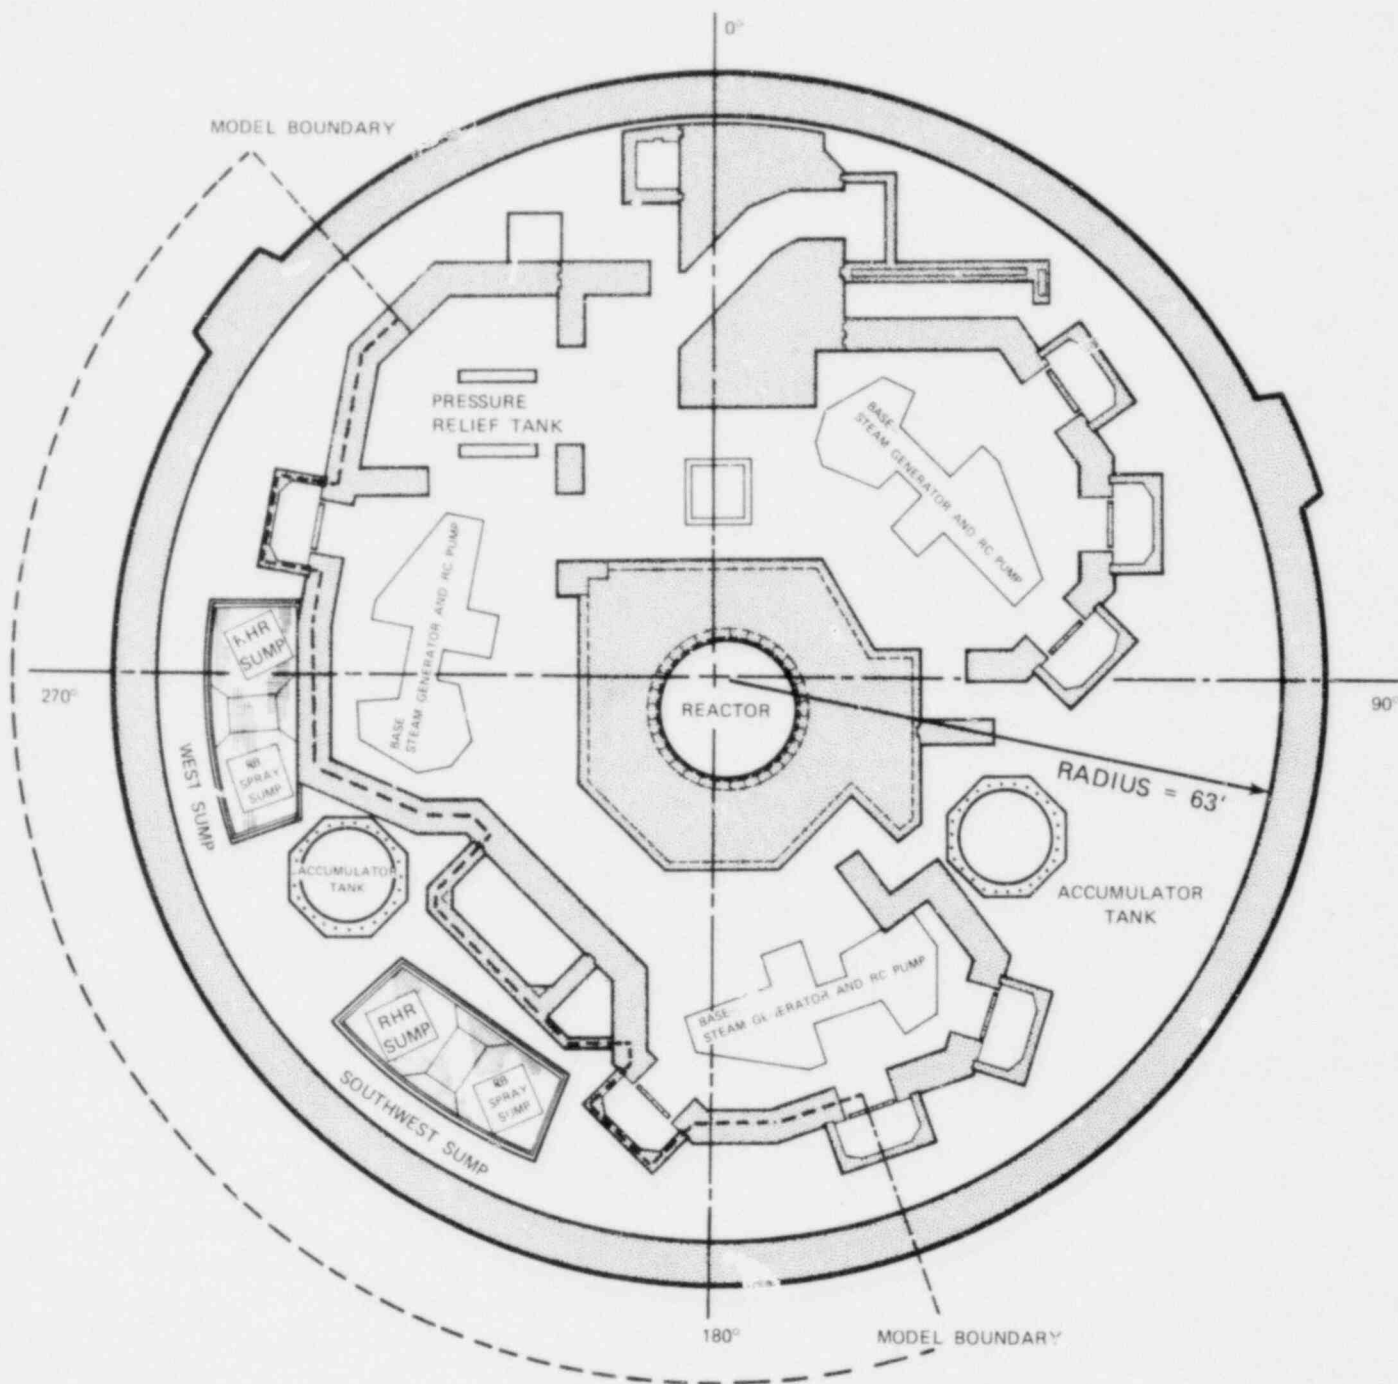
REACTOR BUILDING LAYOUT AT EL 412 FEET
